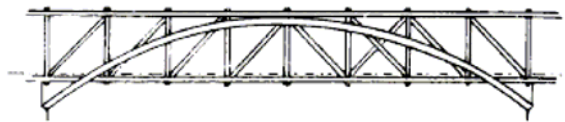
Drawing of a Burr Truss (James 1982b)
